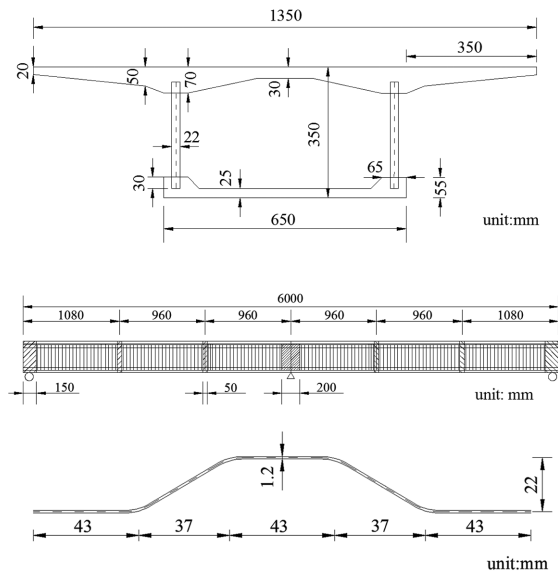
Dimensions of the PC box-girder bridge model with CSWs: (a) cross-sectional view, (b) elevation view, and (c) corrugated steel web.
